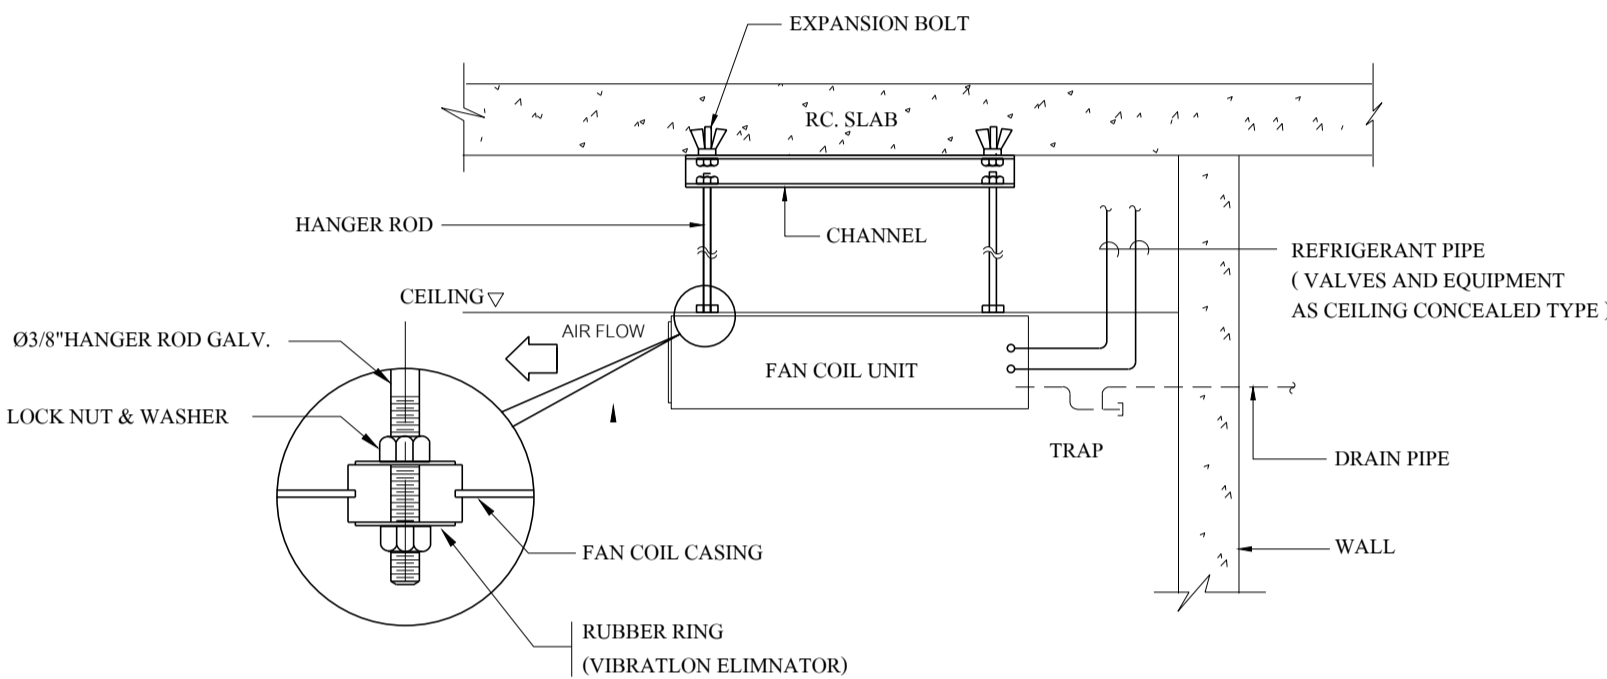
DETAIL CEILING MOUNTED CENTRIFUGAL FAN
